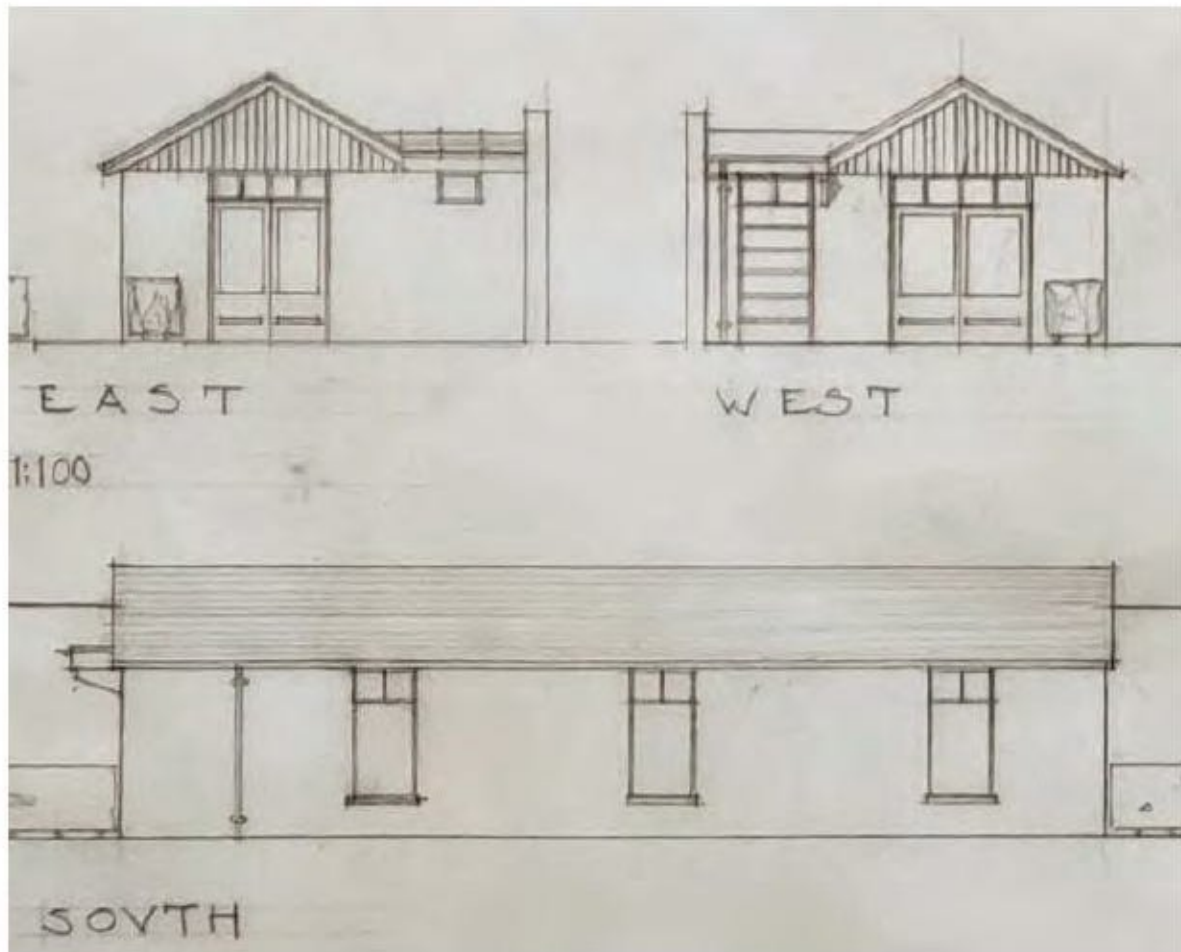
Proposed elevations for cottage 4 Extract of drawing CC0175WG6
